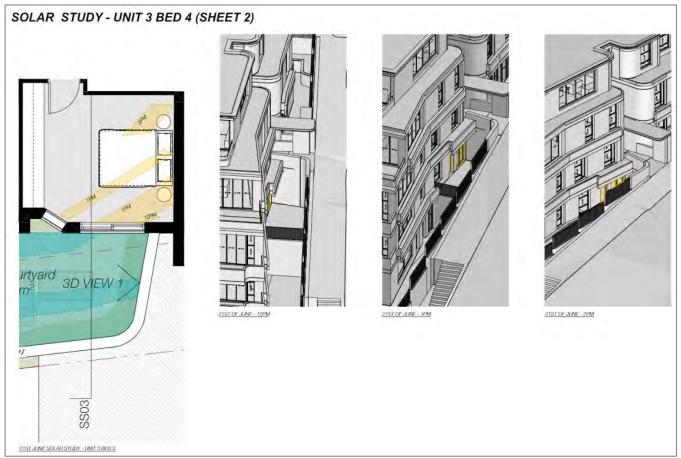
Extract of DWG No. 9413 – demonstrating proposed amendments to provide improved solar access into Unit 3 Bedroom 4 (Source: MHNDU)
